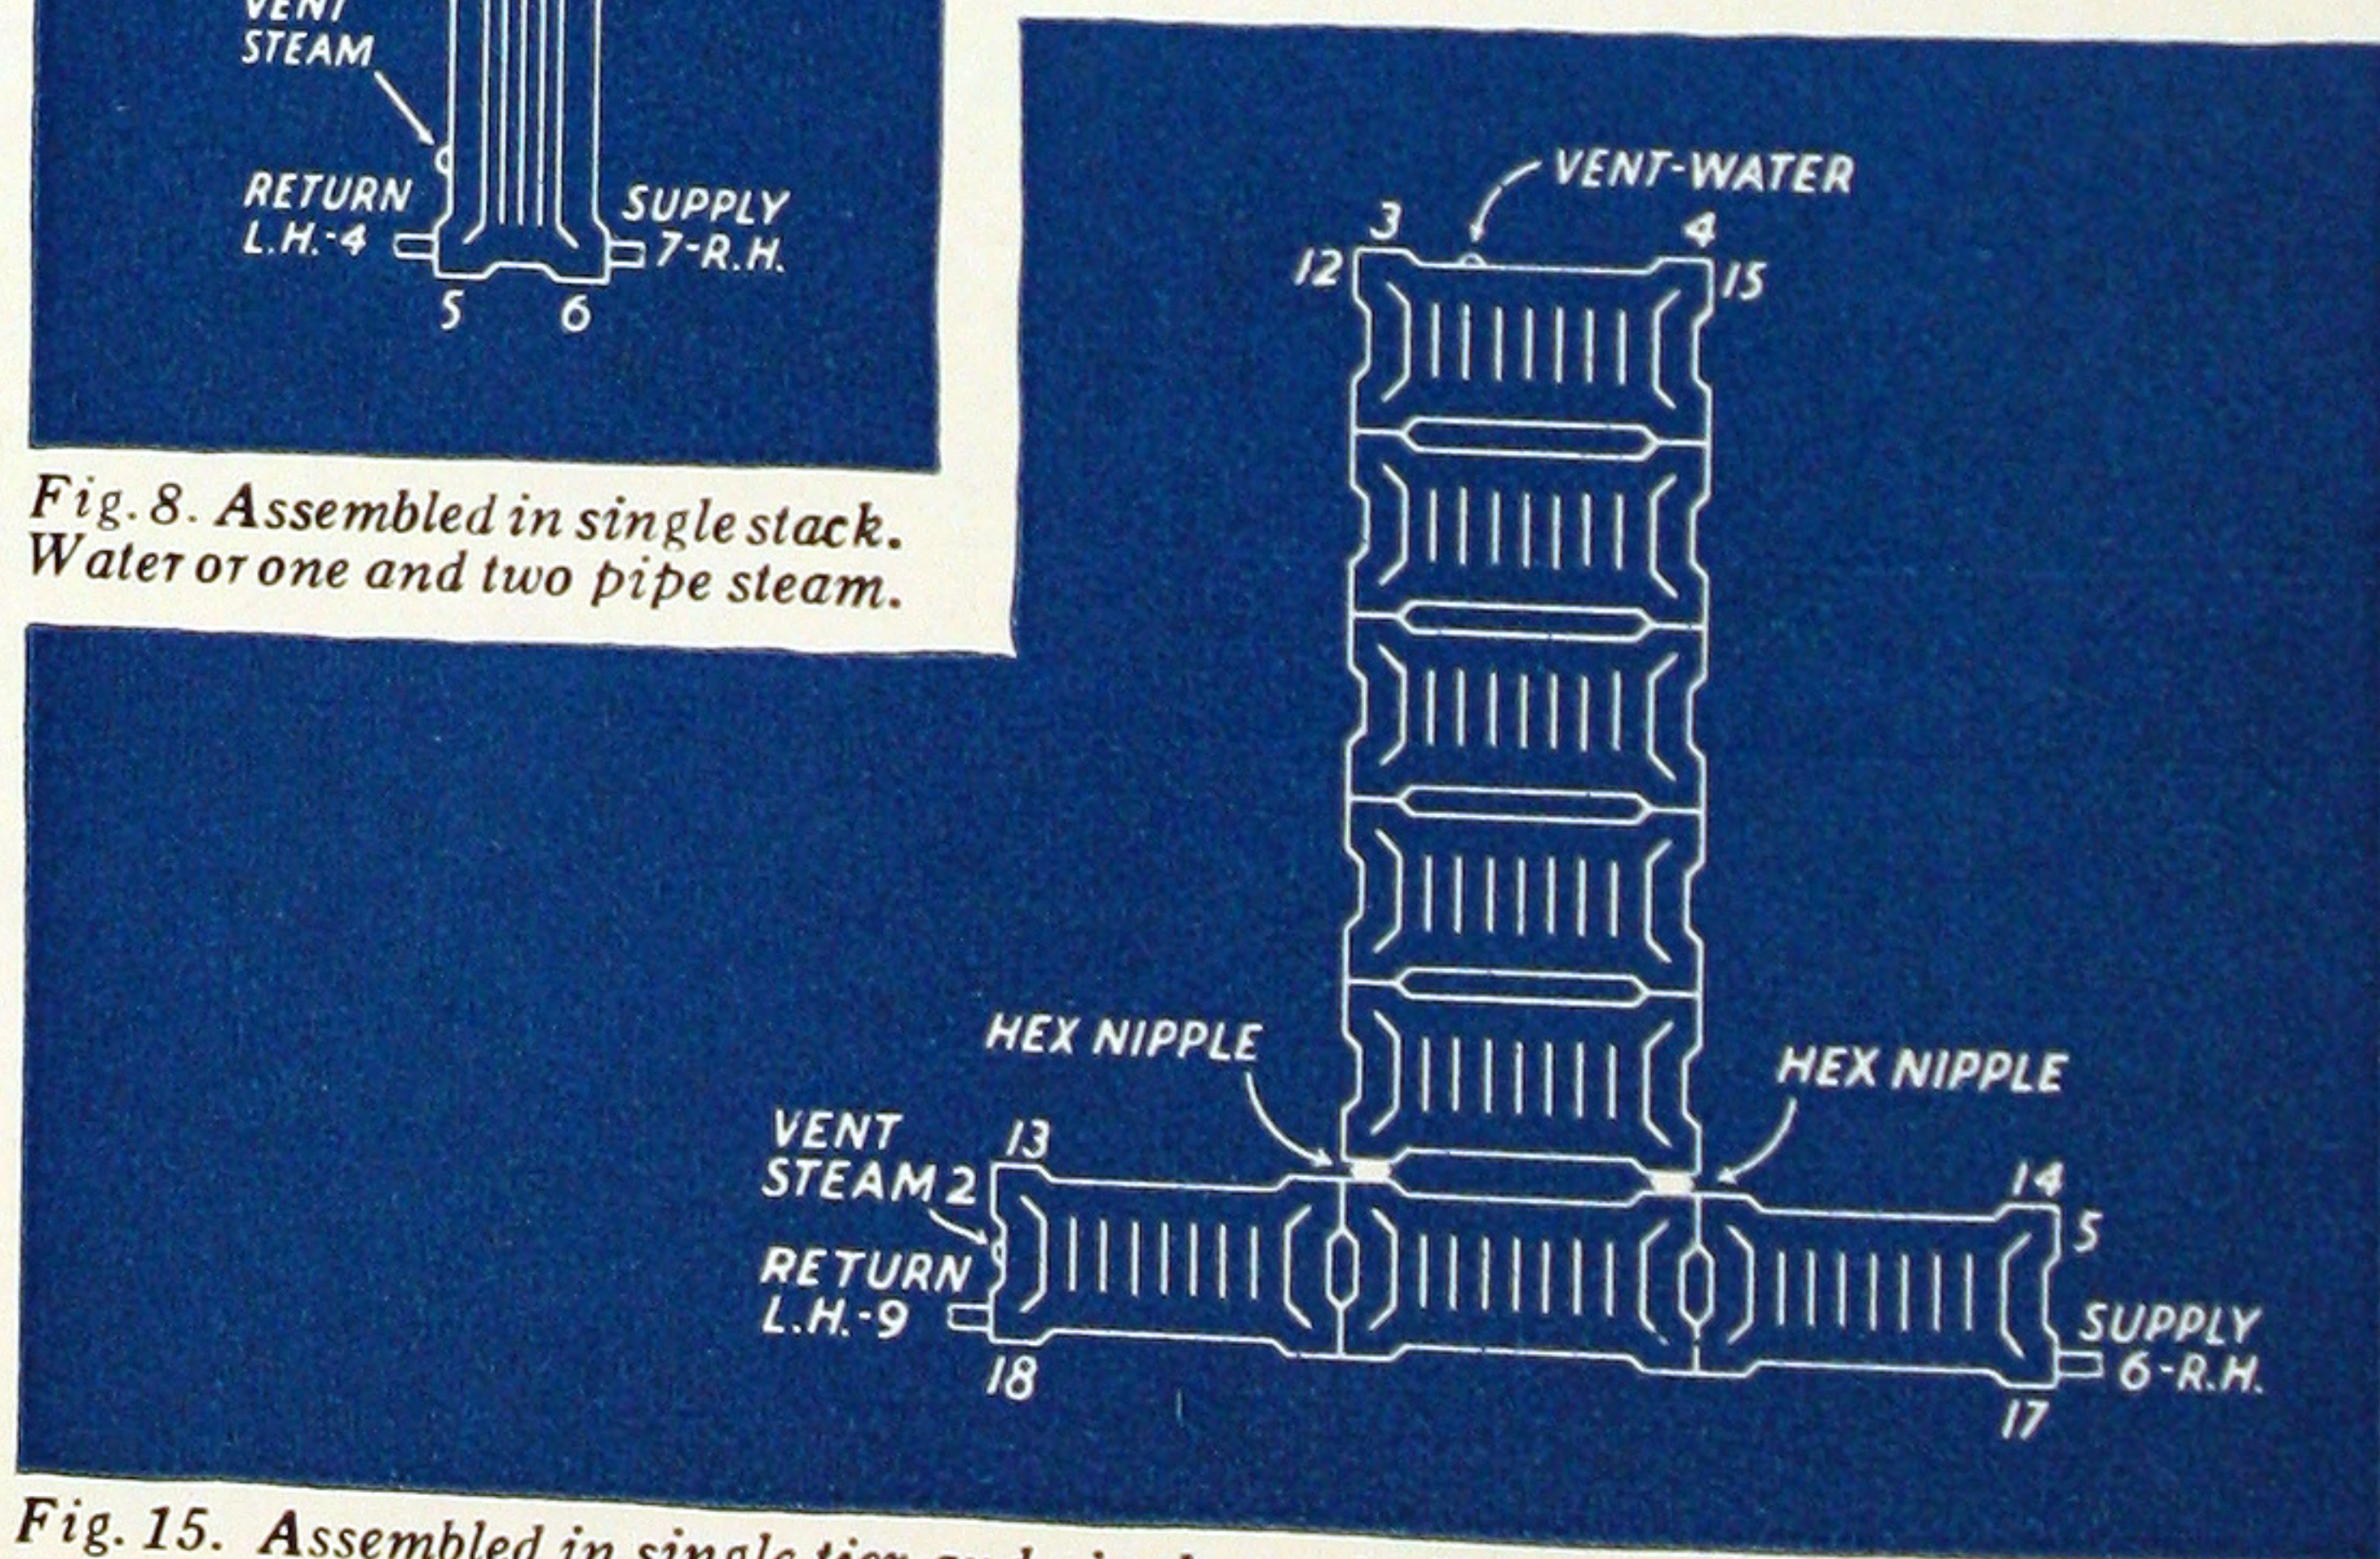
Assembled in single tier and single stack. Water or one or two pipe steam.
